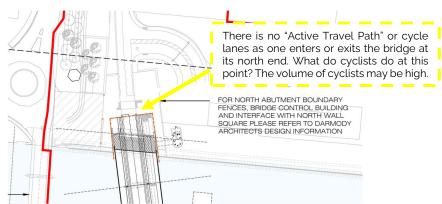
Excerpt from 'SPAR Bridge Proposed Context Plan' (Source: Dwg. No. MOXON-SBR-SP-DR-A-100-00001)
